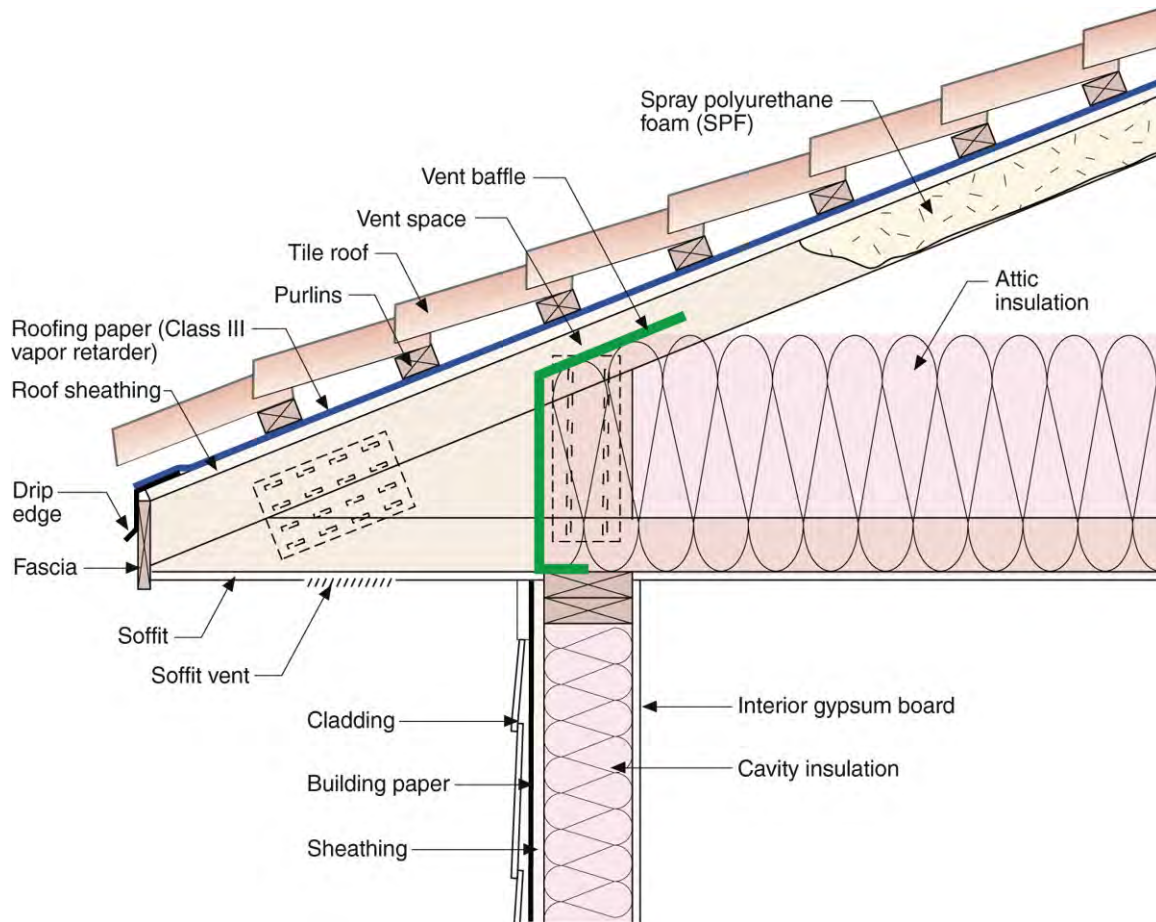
Vented Attic – Tile Roof – Air Impermeable Insulation On Underside of Roof Deck - Can be used in all climate zones. In CEC Zone 16 (IECC Climate Zone 5 or higher) a Class II vapor retarder should be installed at the ceiling plane below the insulation. In all other climate zones a vapor retarder is not required. A ventilation ratio of 1:300 is recommended in all climate zones and is a basic code requirement in the IRC for vented attic assemblies. The roofing paper can be substituted with an impermeable fully adhered impermeable membrane with no apparent moisture risk. In this configuration – the attic space is vented - the vapor transmission characteristics of the SPF are not significant. Accordingly, either low density or high density SPF can be used in all climate zones including CEC Zone 16.
